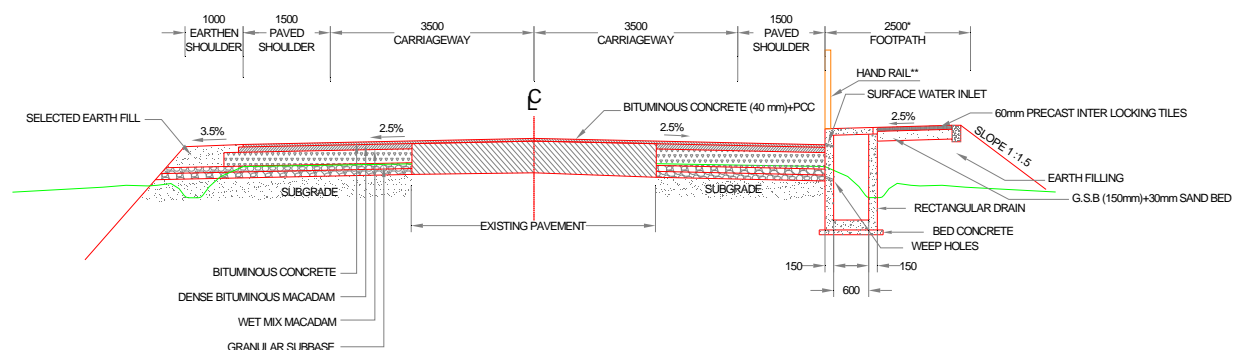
TYPICAL CROSS SECTION- TYPE-2FIGURE 14. TYPICAL CROSS SECTION- TYPE-3FIGURE 15. TYPICAL CROSS SECTION- TYPE-4FIGURE 16. TYPICAL CROSS SECTION- TYPE-5
